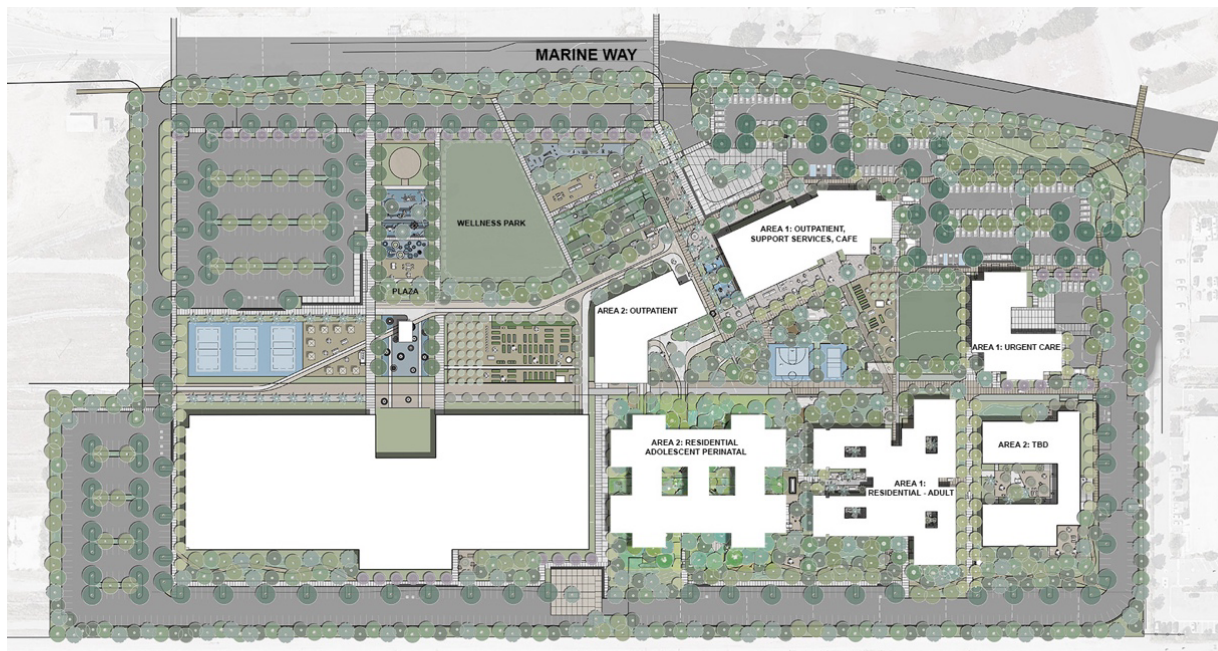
Be Well OC Irvine Campus master plan. Substance Use programs will be located in the building labelled “Area 1: Residential – Adult.”
